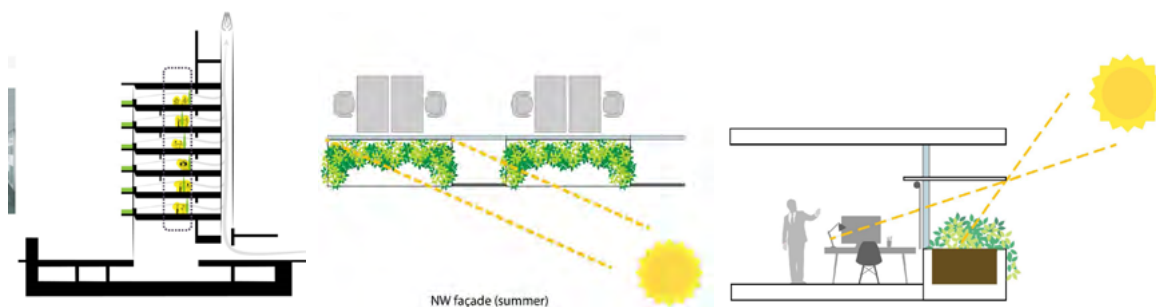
The double facade acts as a solar chimney to enhance air movement and has balconies redesigned with green walls and shading elements.
